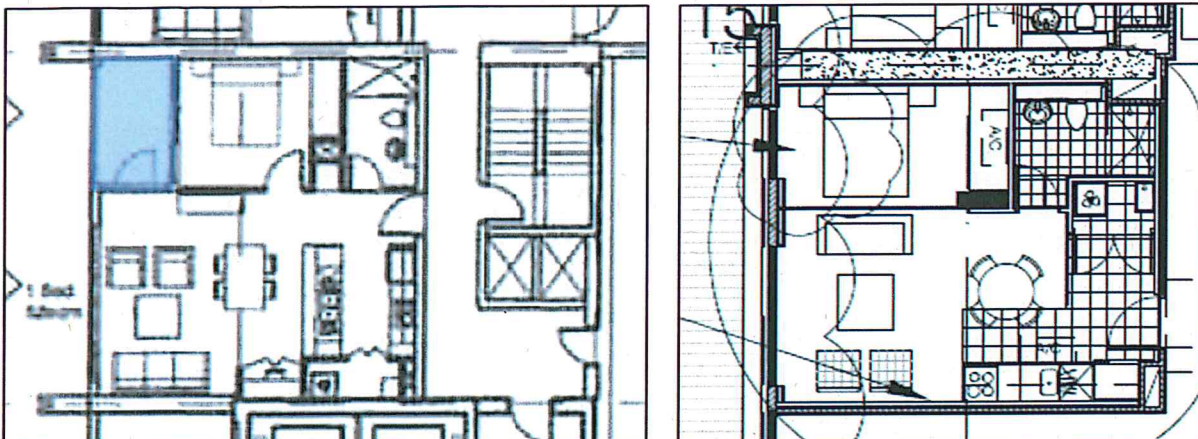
Approved apartment layout (left) and proposed apartment layout (right)
